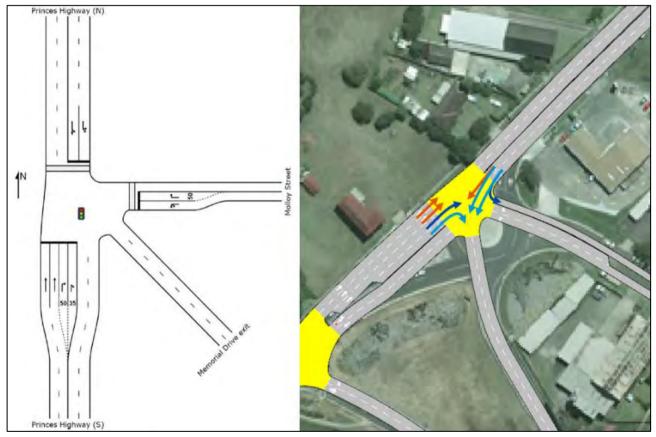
Traffic lights layout at Princes Highway/Molloy Street
